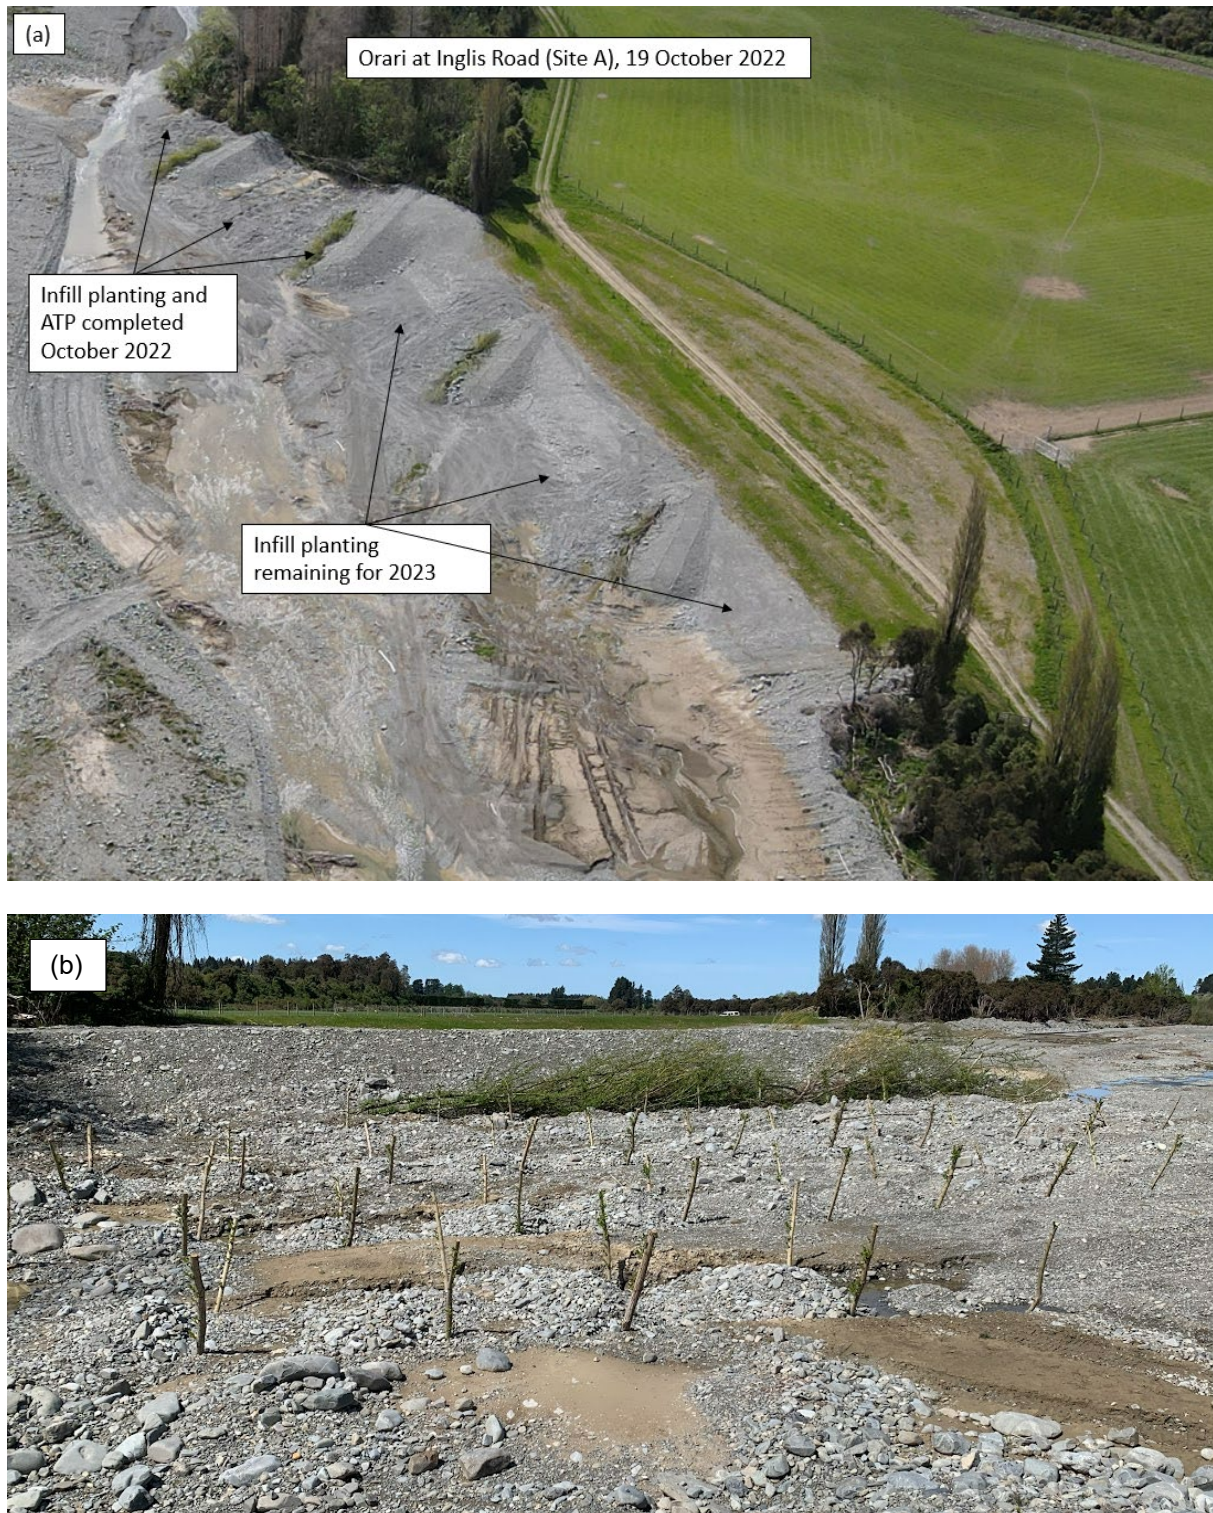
Orari at Inglis Road, Site A: (a) completed stopbank and erosion bunds with some infill planting, (b) infill planting detail.
